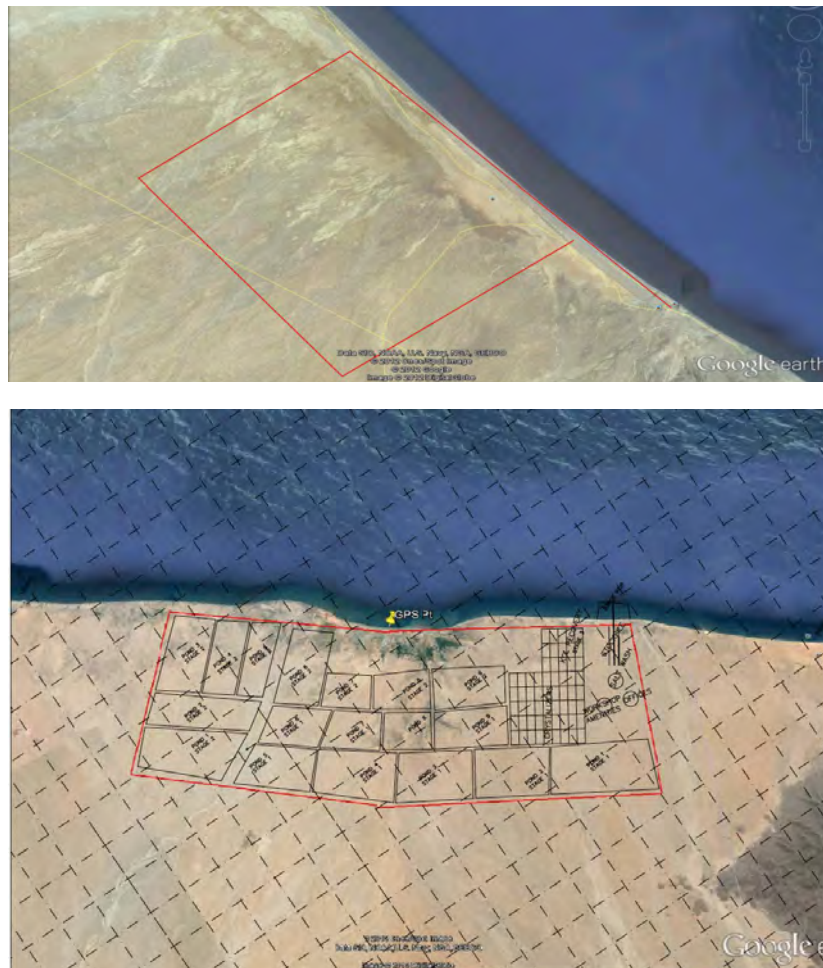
Site Plan showing the area and pond configuration used for the production of solar salt
